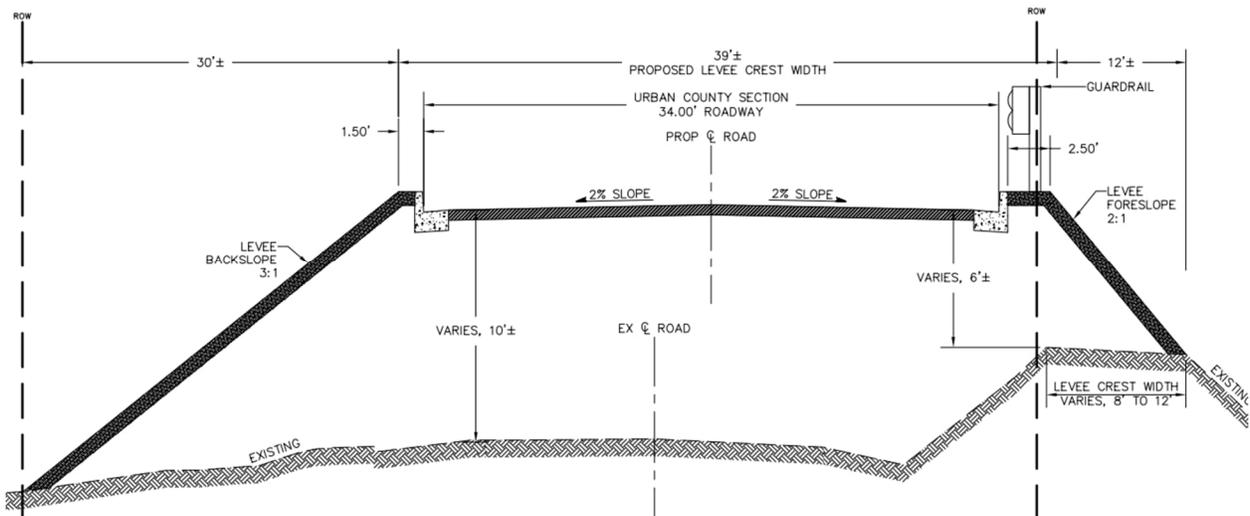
Combined Urban County Road and Levee Typical Section (south of Star Park)
